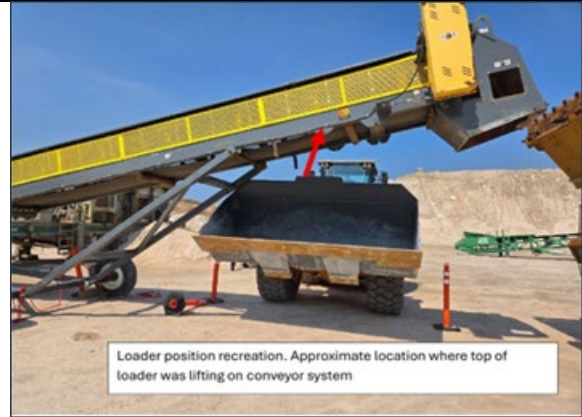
Post-incident view of the raised stacker head end with the loader bucket adjacent to the frame, illustrating the loader-to-stacker contact.
